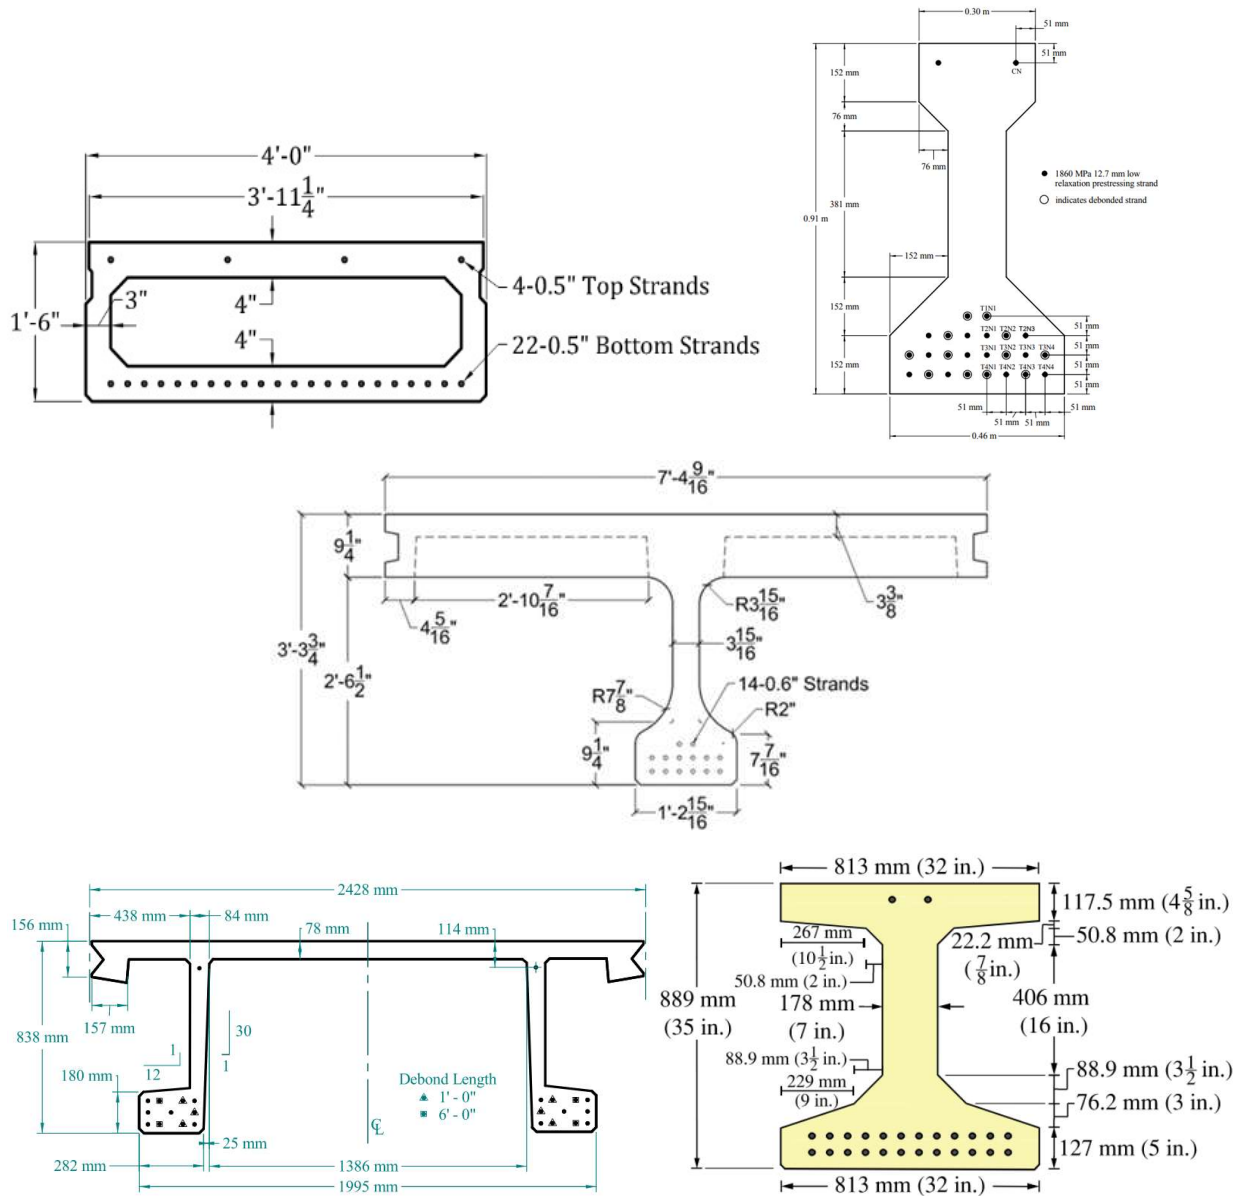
Various precast/prestressed bridge superstructure sections tested in flexure
